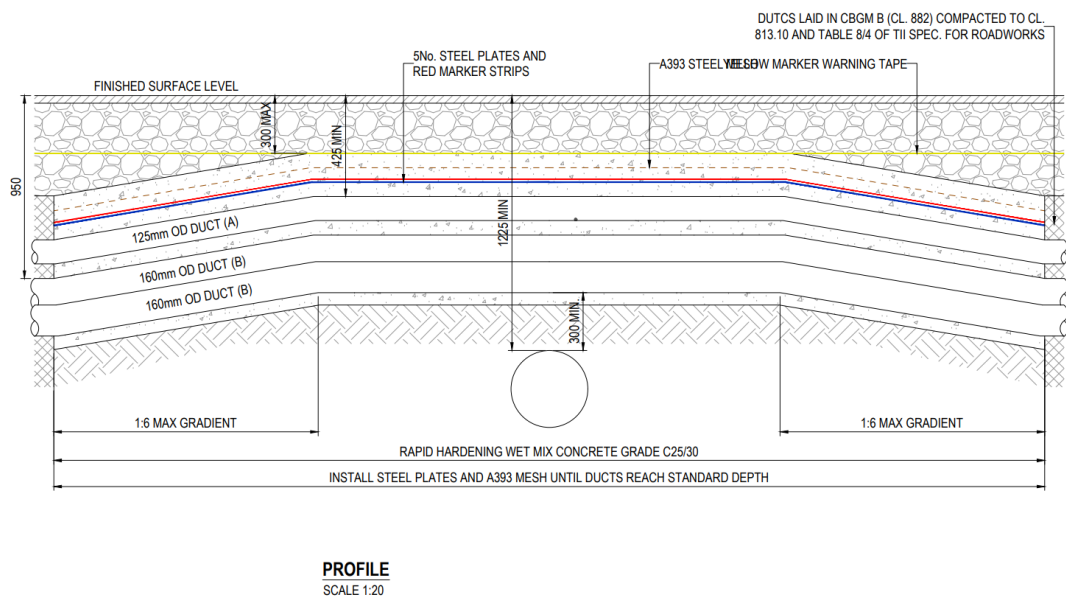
Typical overcrossing detail (CSEA sheet: 1544)
